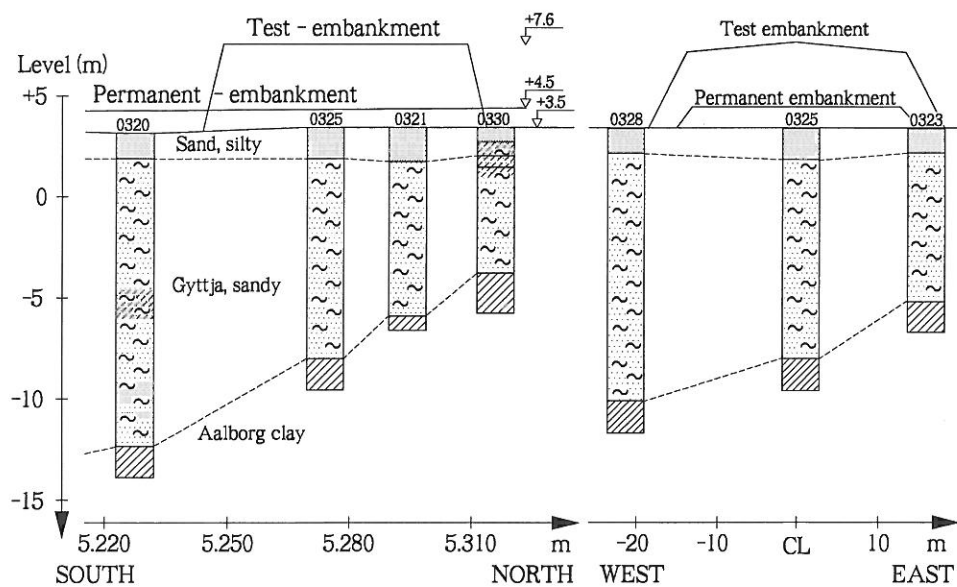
Geotechnical section of test embankment. (a) longitudinal section; (b) cross section.
